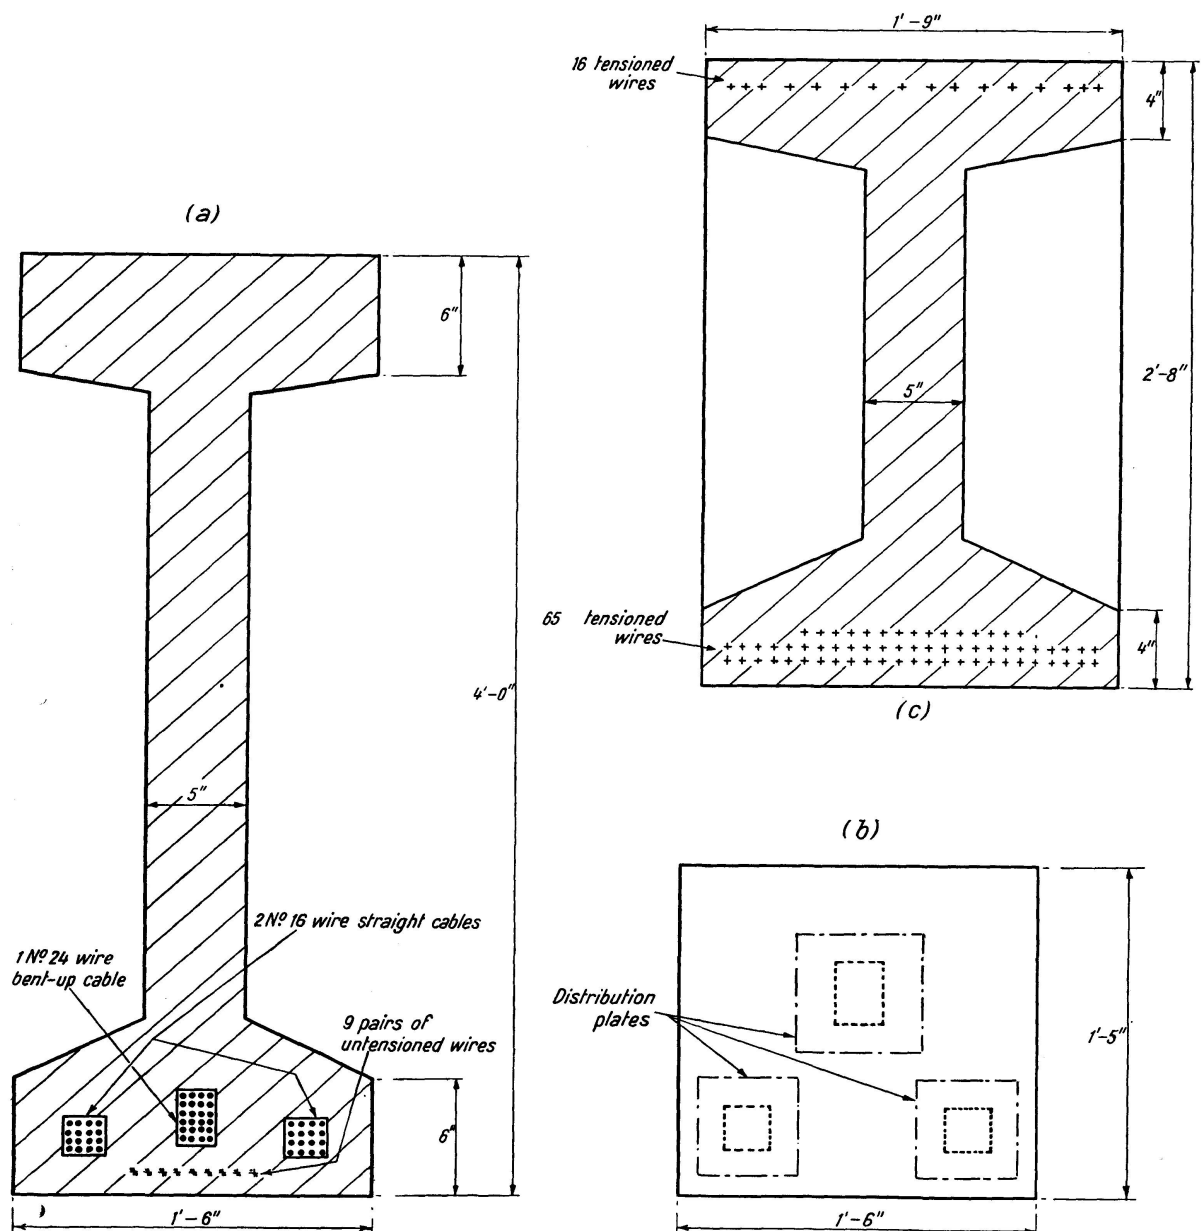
Cross sections of (a) and (b) roof beam and (c) of eaves beam, Bury St. Edmunds
